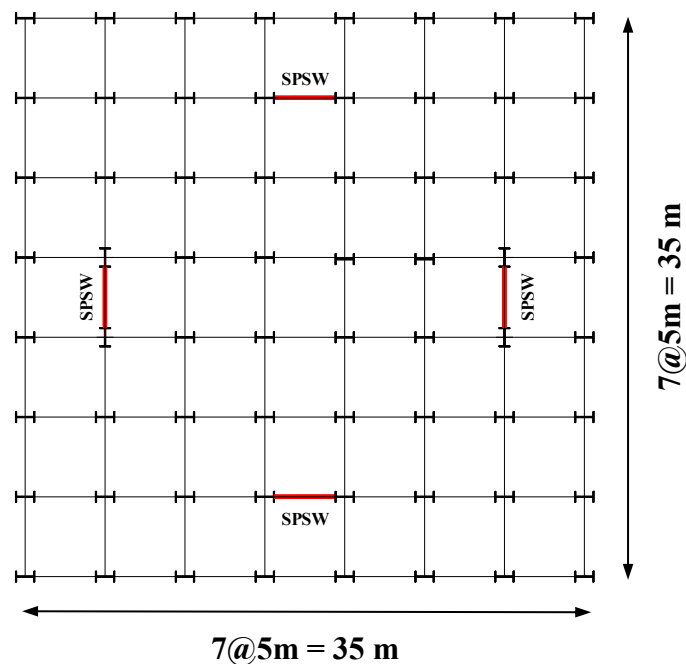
Typical floor plan of the hypothetical SPSW building
